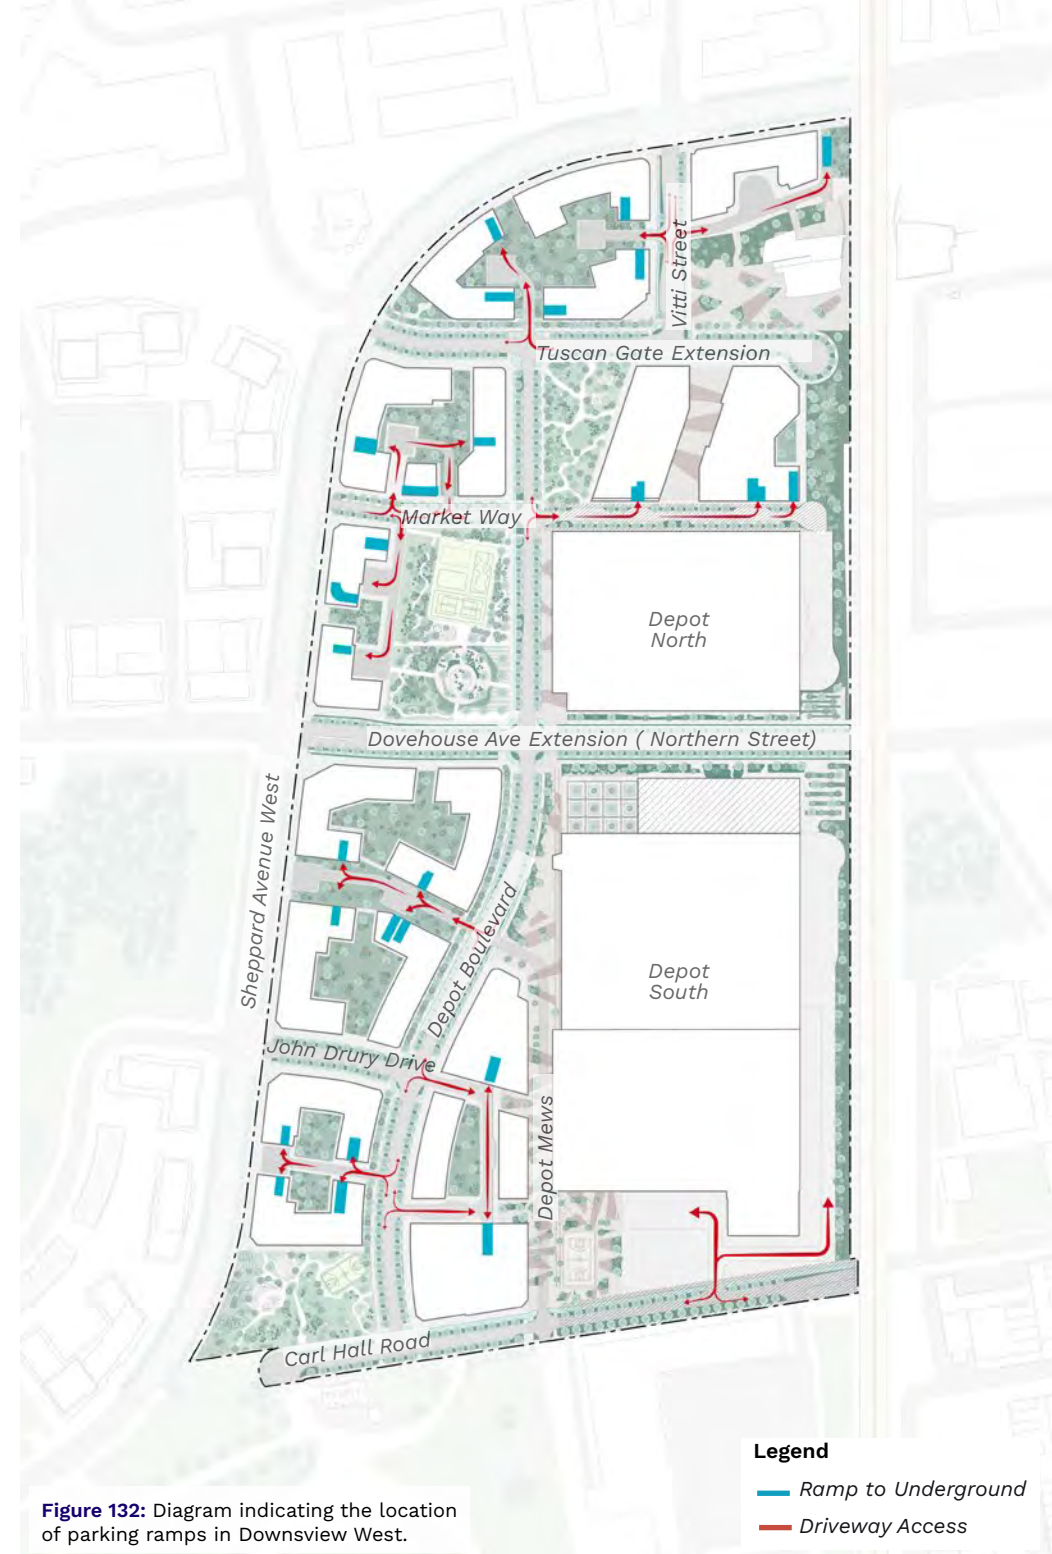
Diagram indicating the location of parking ramps in Downsview West.
